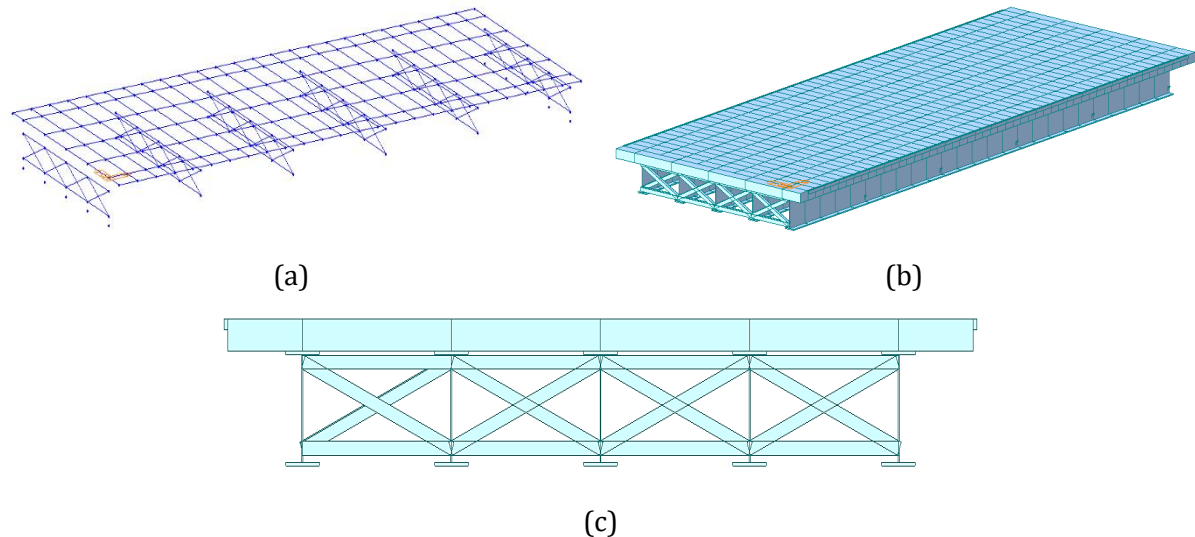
Finite element model of the developed composite I-girder bridge superstructure (a) Grillage model, (b) 3D model and (c) Cross sectional view
